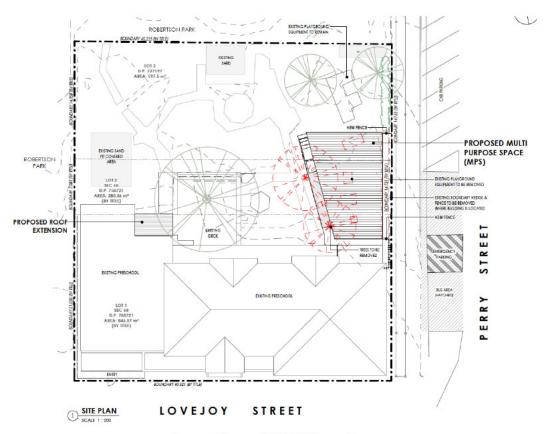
LAYOUT (SUNRAI DESIGNS)
